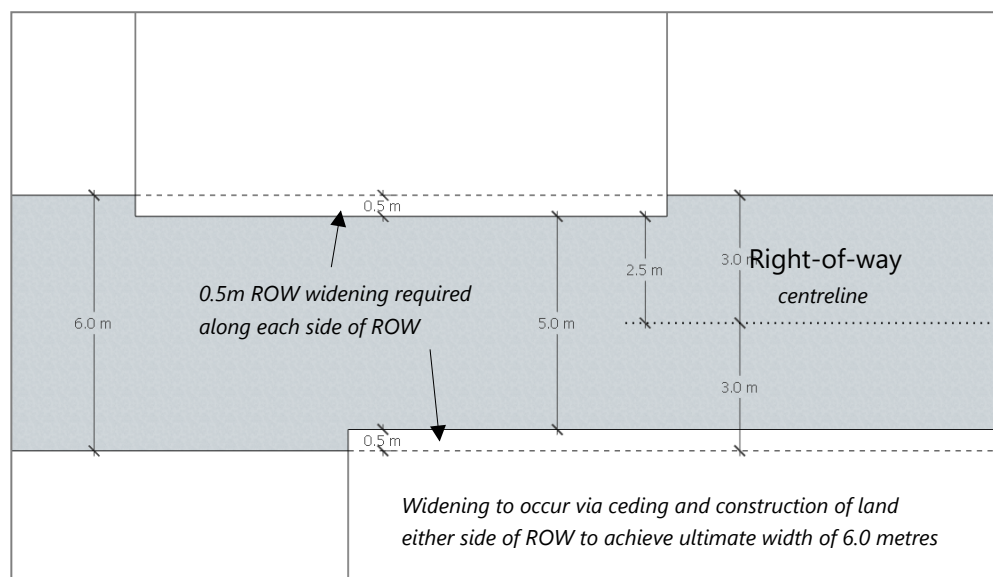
Provision for construction and ceding of land for widening of right-of-way
